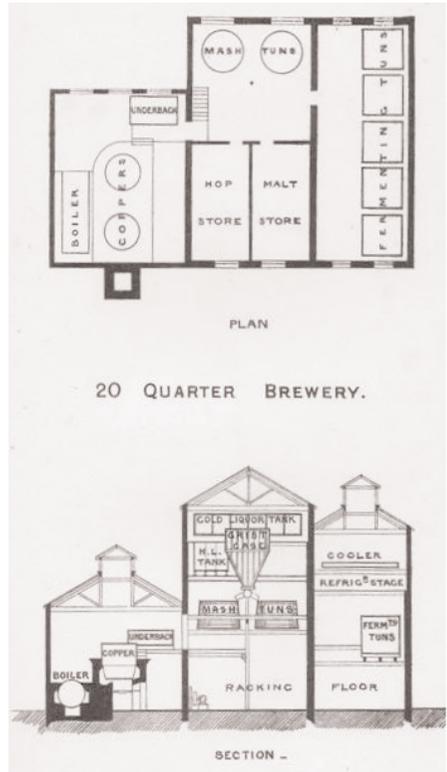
A pumped tower brewery, from George Scamell & Frederick Colyer's Breweries and maltings: Their Arrangement, Construction, Machinery, and Plant, 2nd edition published in 1880.
